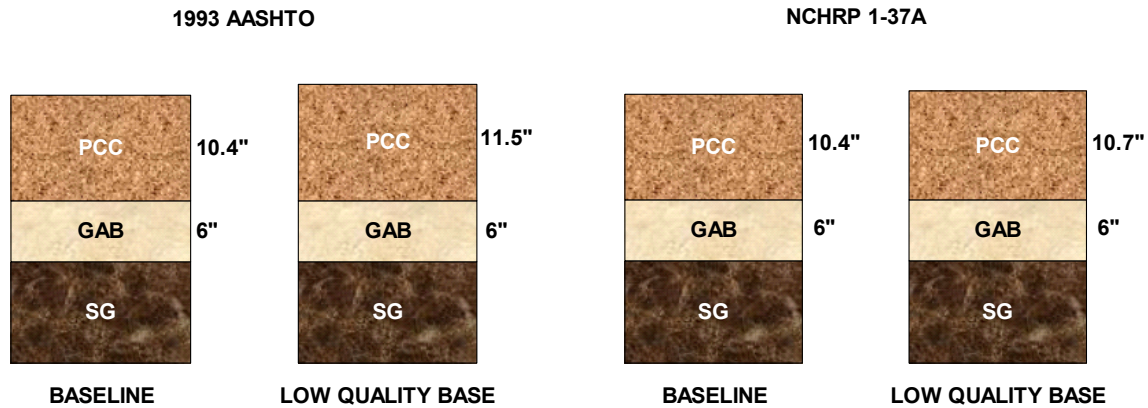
Summary of rigid pavement sections: low quality base scenario.
